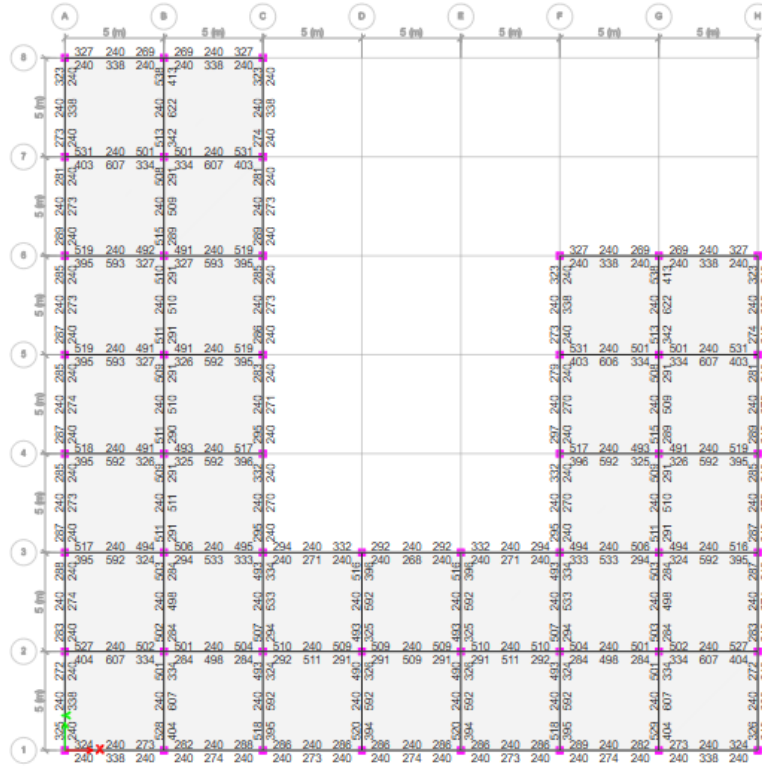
4 Sample designs of buildings in the plan view for regular plan model
